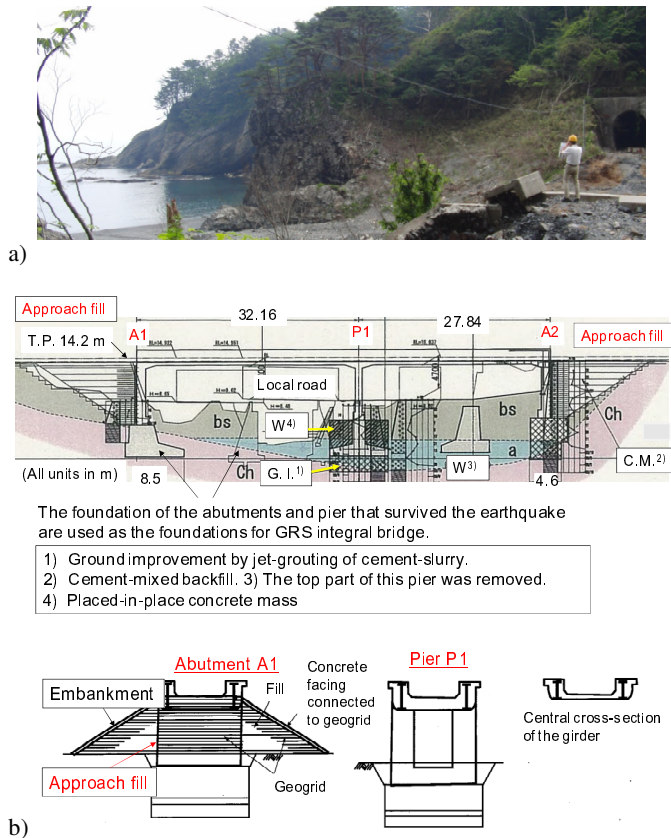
a) Fully collapsed conventional type bridge (13th July 2012); and b) plan of GRS integral bridge seen from the seaside (under construction) at Haipe (site C in Figure 5a), Sanriku Railway
